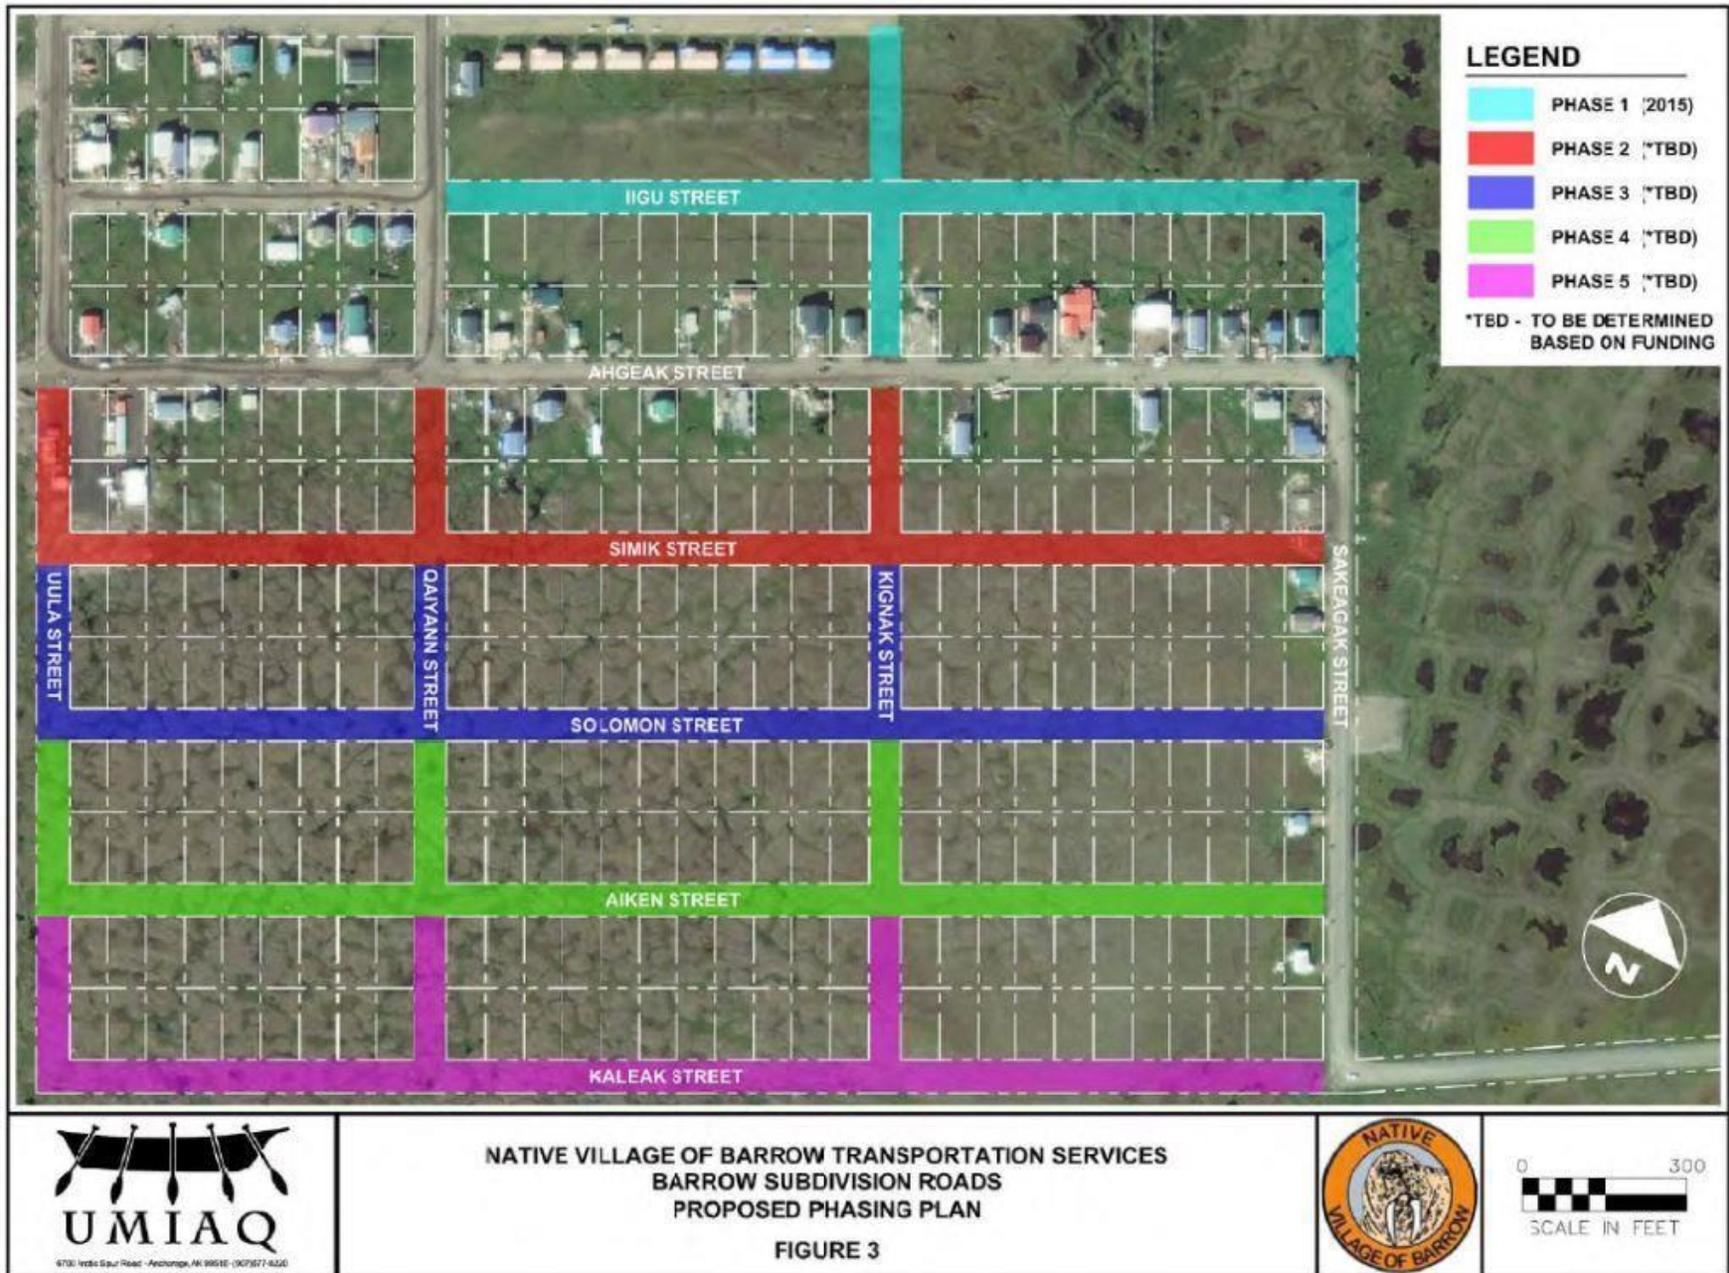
Proposed phases of the east Barrow subdivision road project including Iigu Street, which is proposed for construction in 2015.
